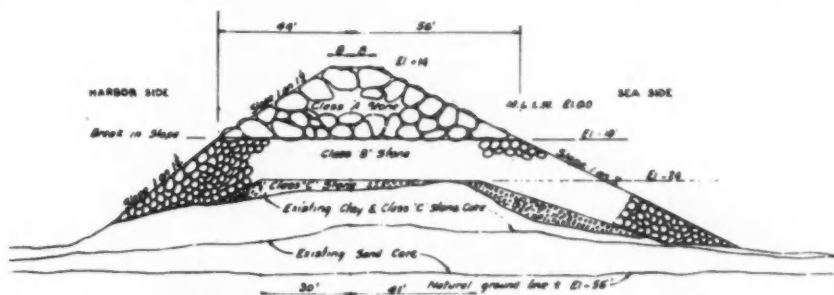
Typical cross-section of the 8,650-ft. Breakwater.
